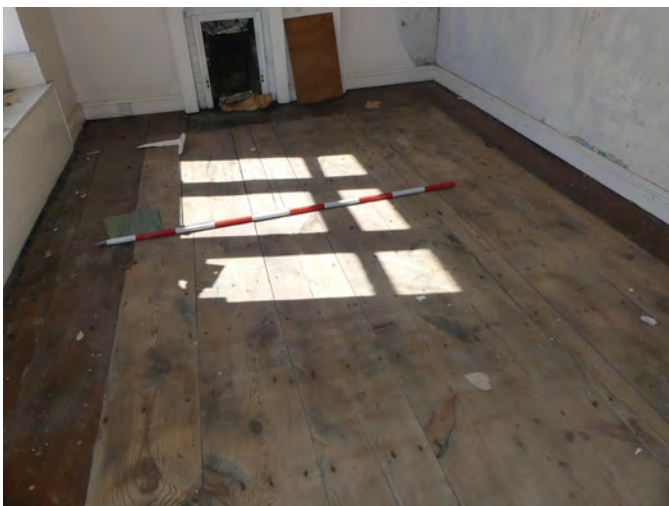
(left): Floor in F8 (farmhouse), viewed from the north-east
